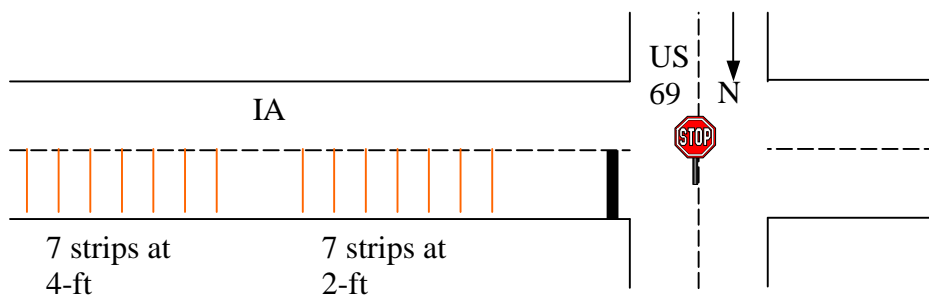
Rumble strips layouts – US 69 and IA 210 – Site A (asphalt pavement).
